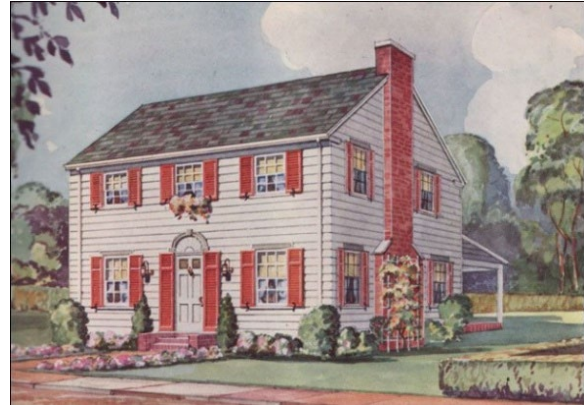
“The Rockford” Dutch Colonial Revival House Plan. *Southern Home Building Plans
